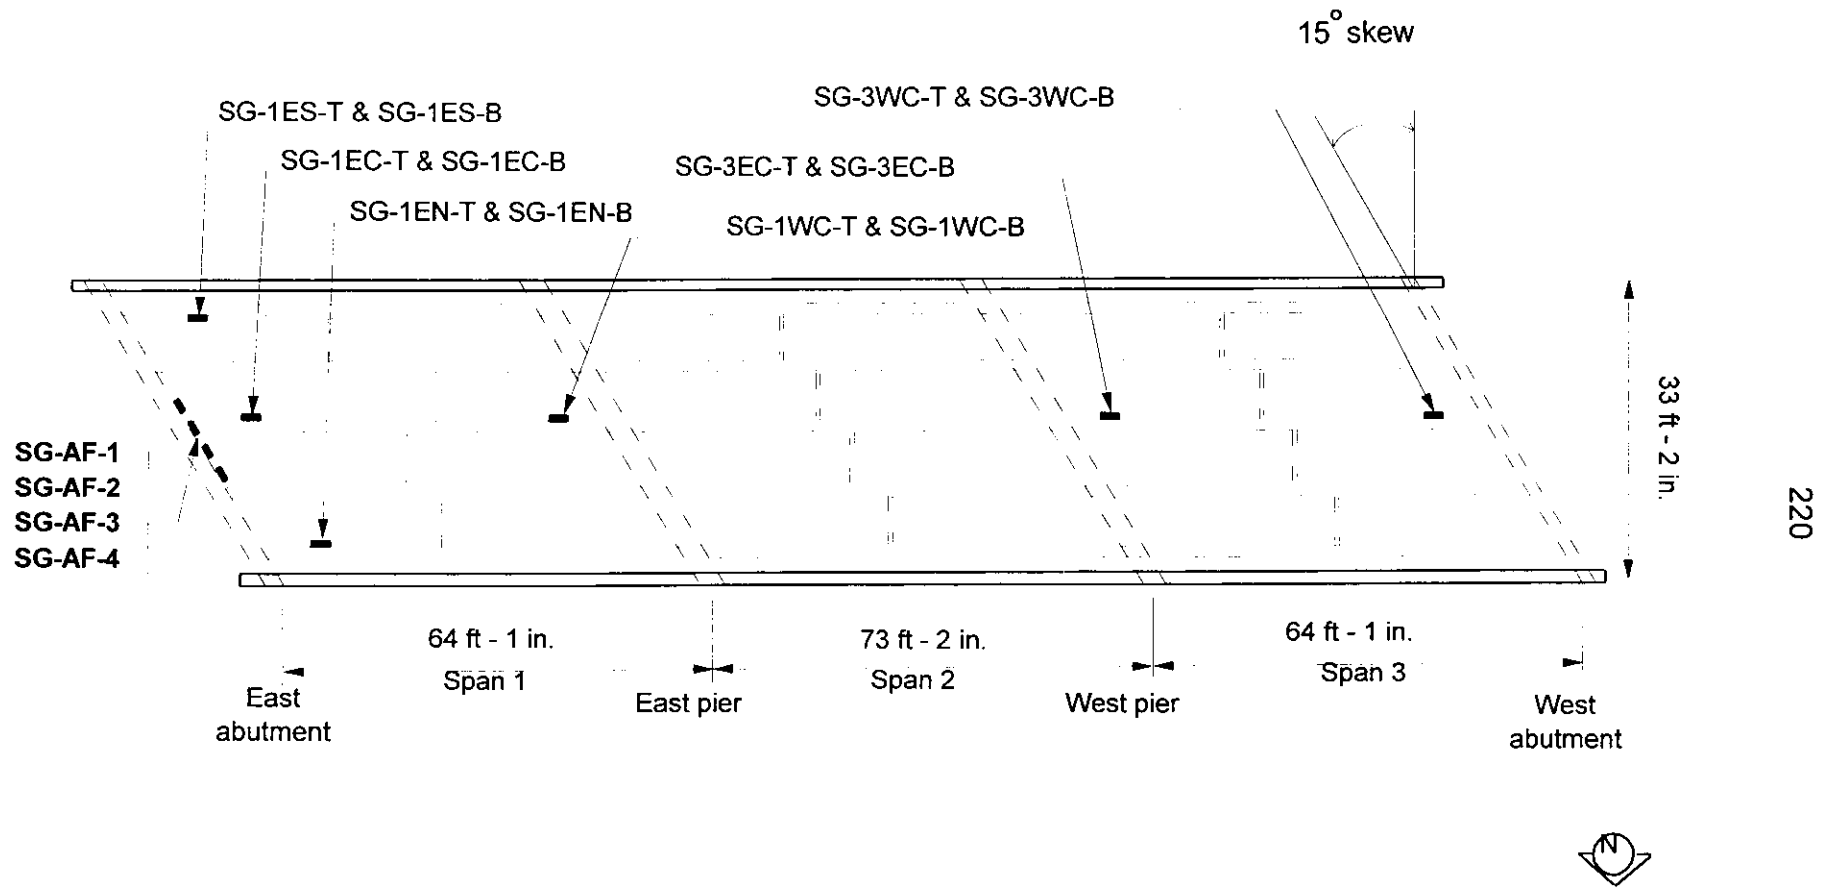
PC girder and RC pile cap strain gage locations at the Story County Bridge (not to scale)
